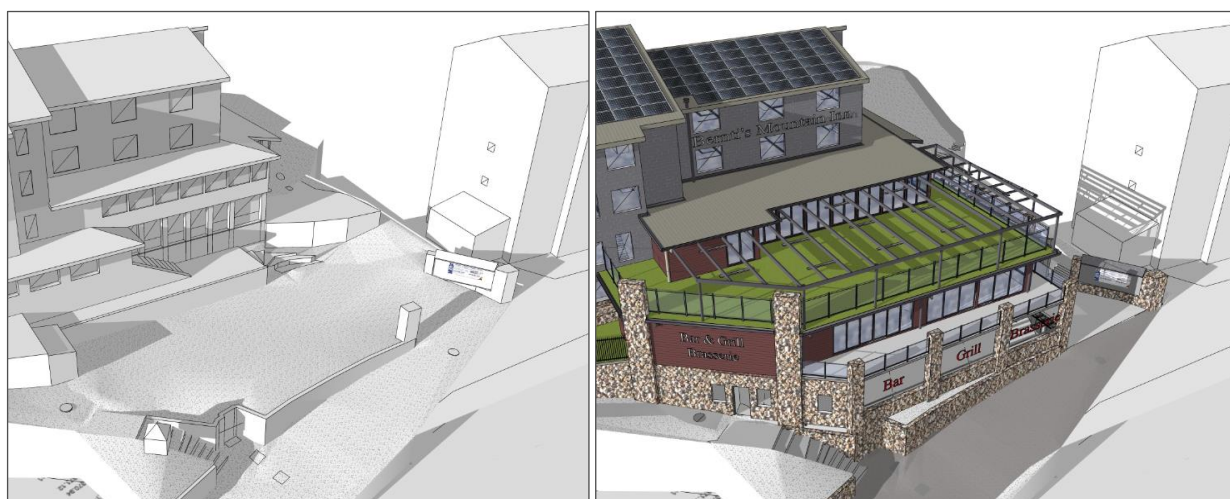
| Existing and proposed overshadowing at 21 June, 9.00am (Source: Applicant's documentation)
